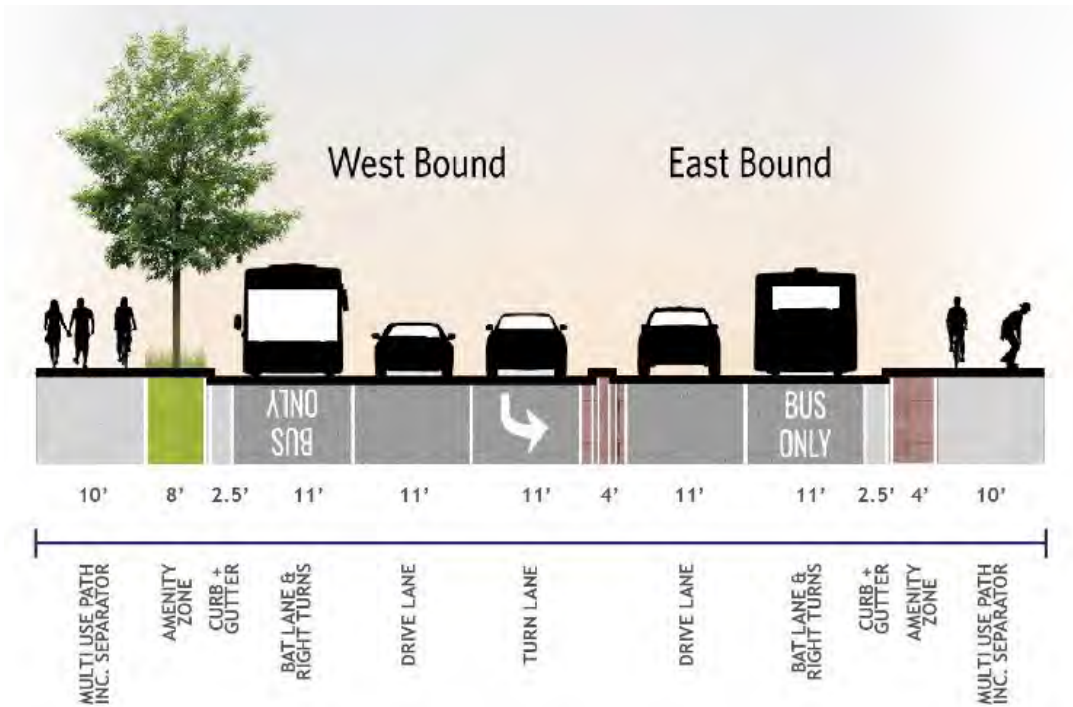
East Arapahoe Avenue street section just east of 63rd Street as described by the CO 7 Project. Section depicts two general purpose travel lanes, outside transit lanes, as well as amenity zone buffers and multi-use paths on both the north and south sides of the street.
